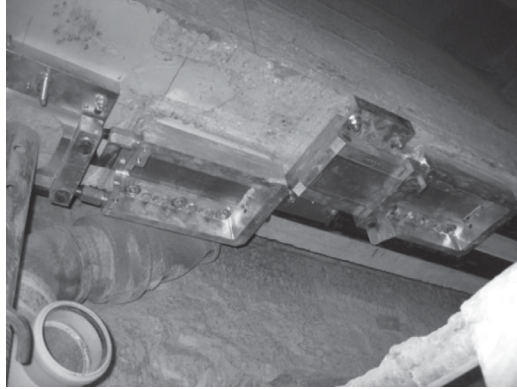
Strengthening of a reinforced concrete beam, anchorage details after removing jack during curing. (Photo courtesy of S&P Clever Reinforcement Company AG, Seewen, Switzerland.)
